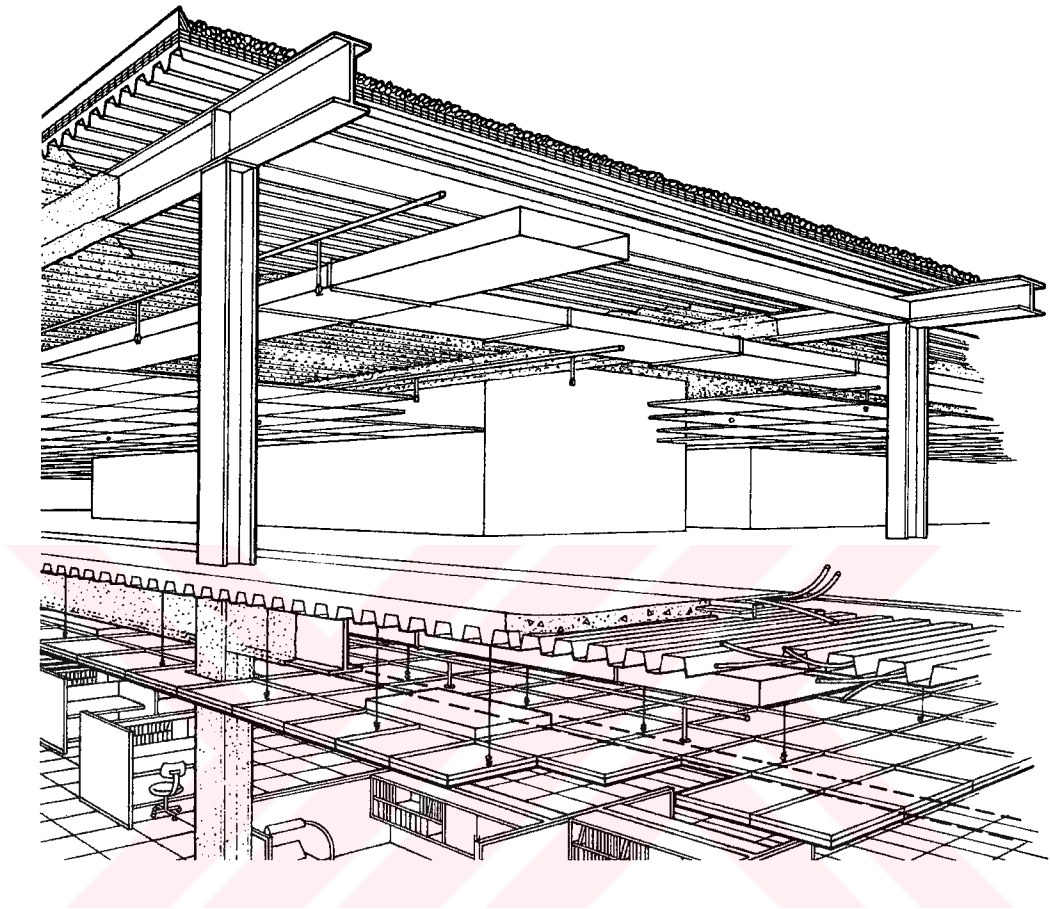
A Detail from A Suspended Ceiling System (Rush, 1986)
